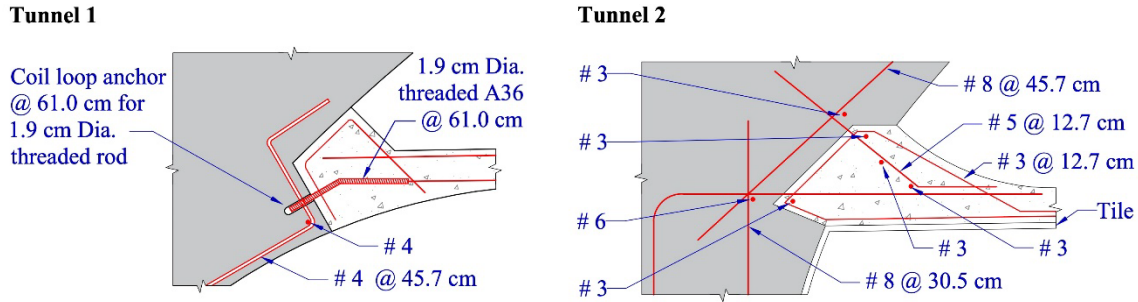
Detailing at the interface of the ceiling panel and tunnel liner
